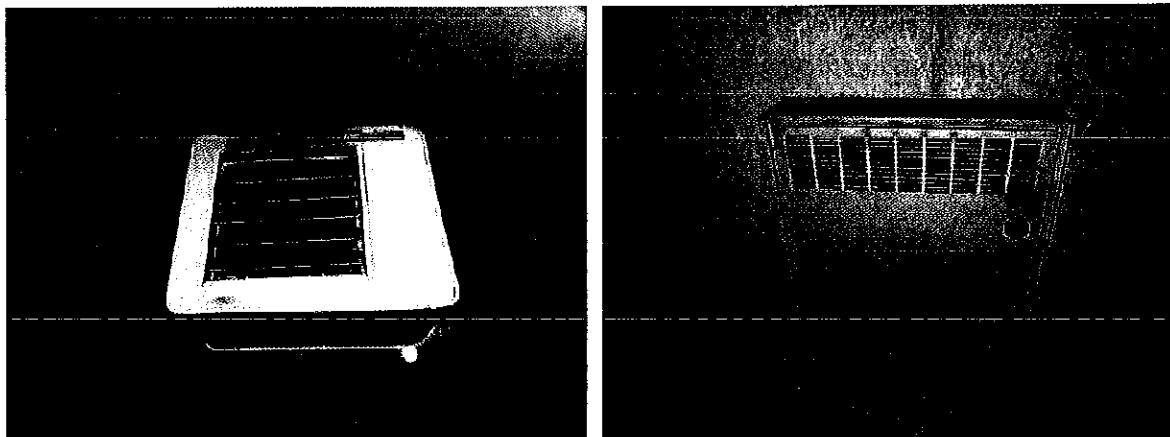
Space heater in the mechanical room (left). Wall-mounted electric heater (right).
